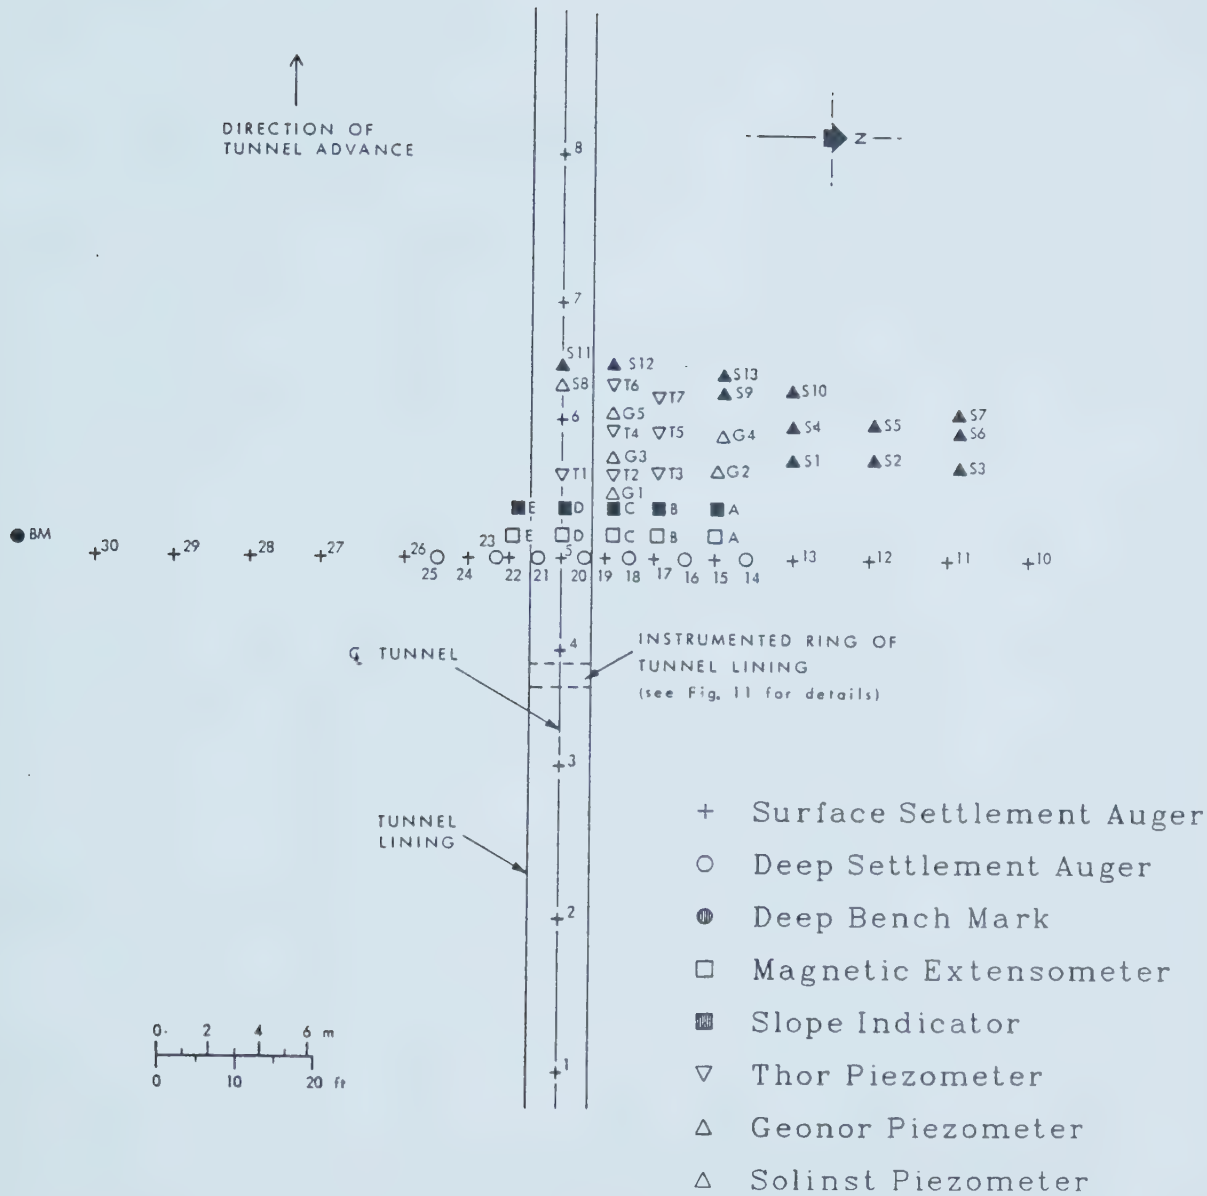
Instrumentation at Array 2; Thunder Bay Tunnel
